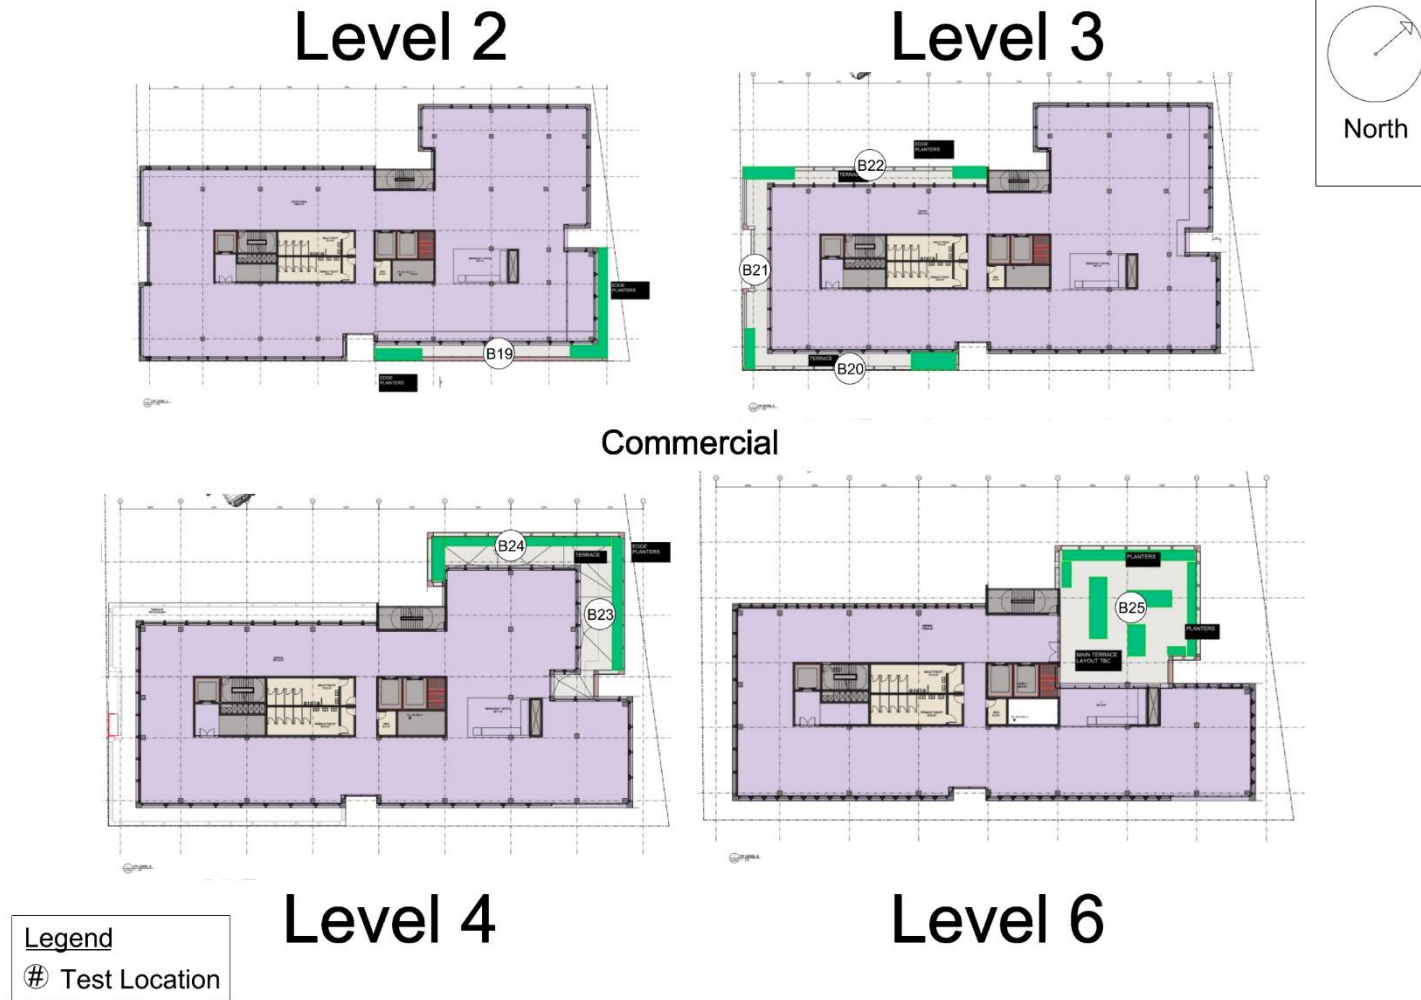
Terrace and Balcony Test Locations on the Commercial building
